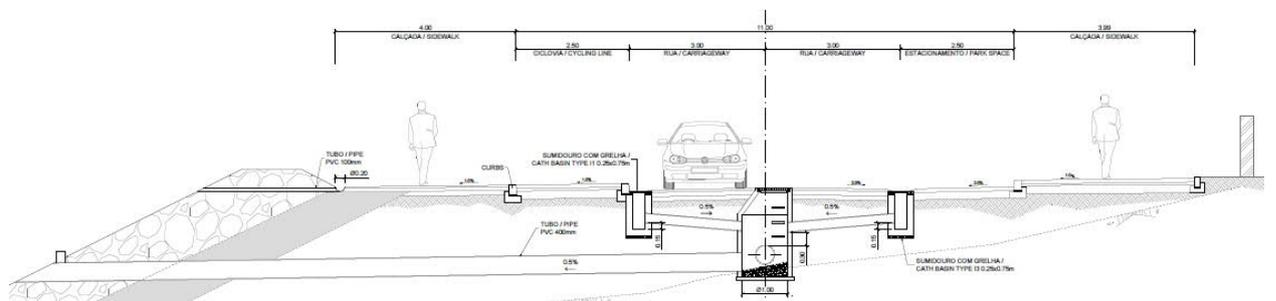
Typical section Ana Chaves Bay (4+540 – 5+900).
